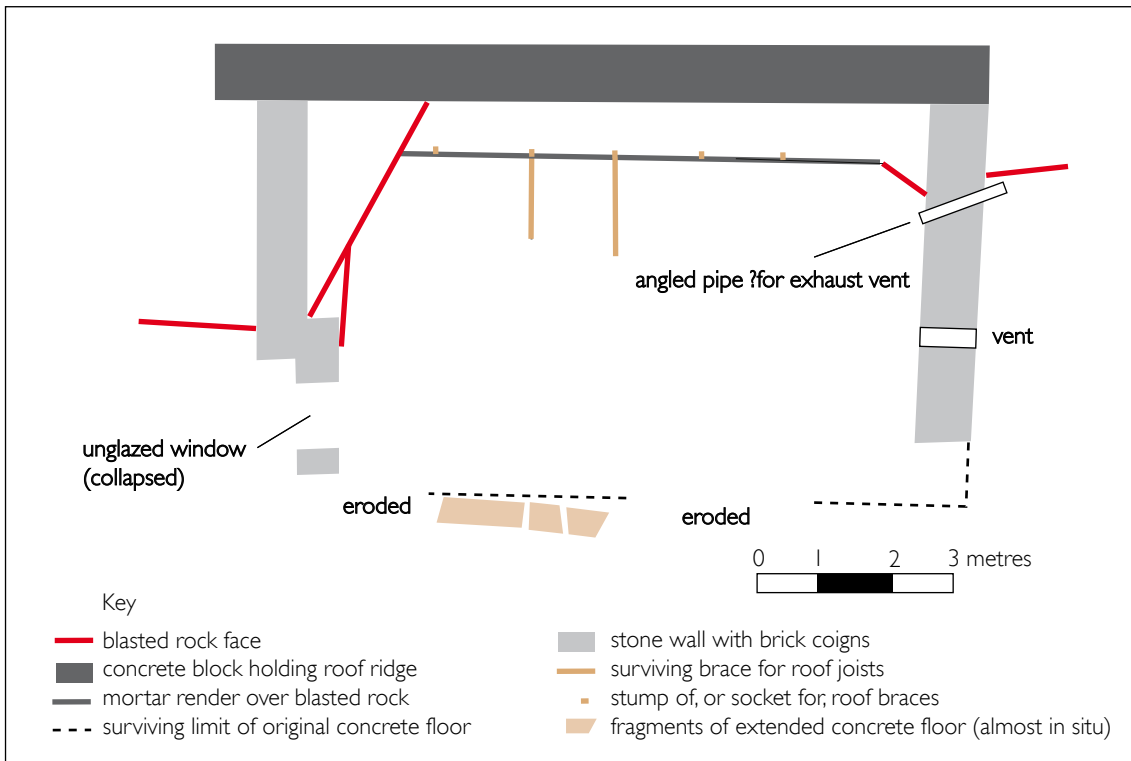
Plan of the hand-sorting shed at 1:100 scale
